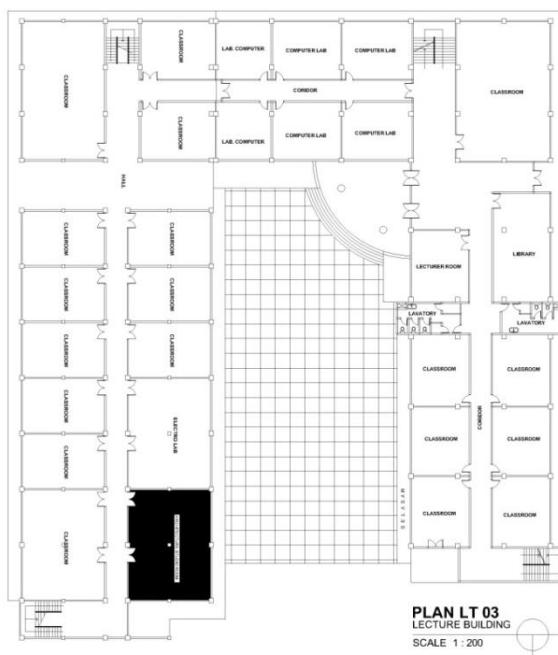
Floor plan 3 Universitas Ichns Gorontalo
